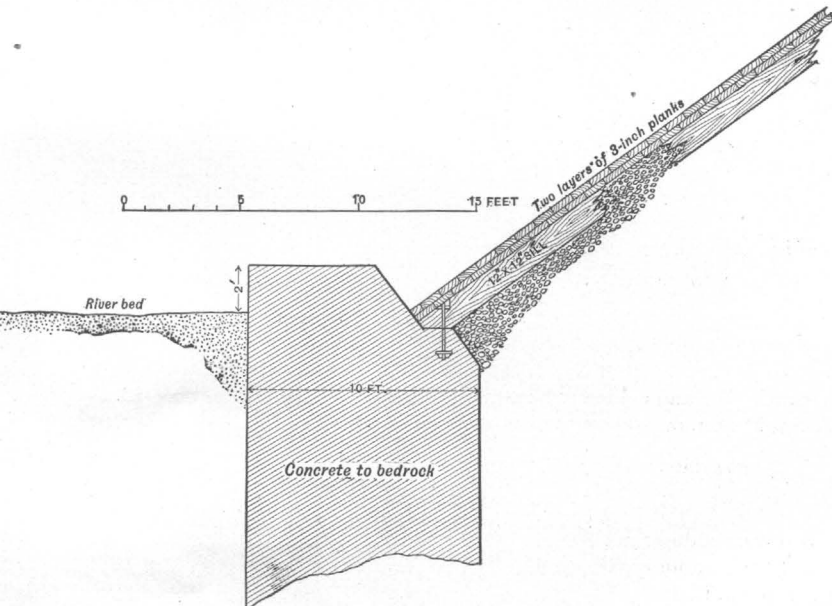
Detail of plank face, rock-filled dam, East Park dam site.
